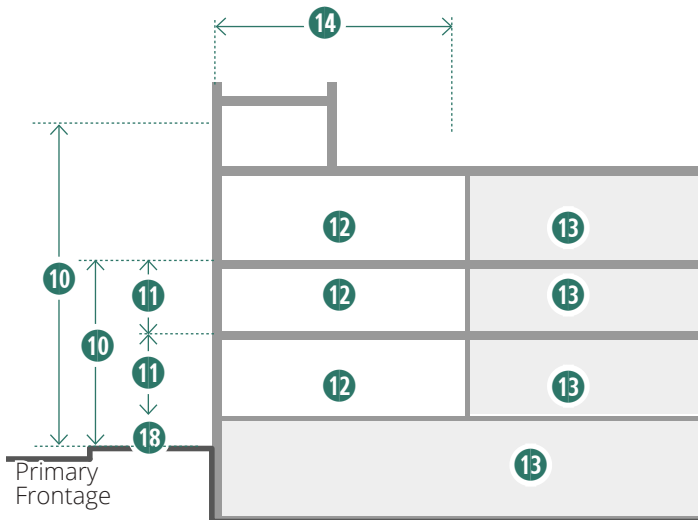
E-2. General Building: Height & Use Requirements
